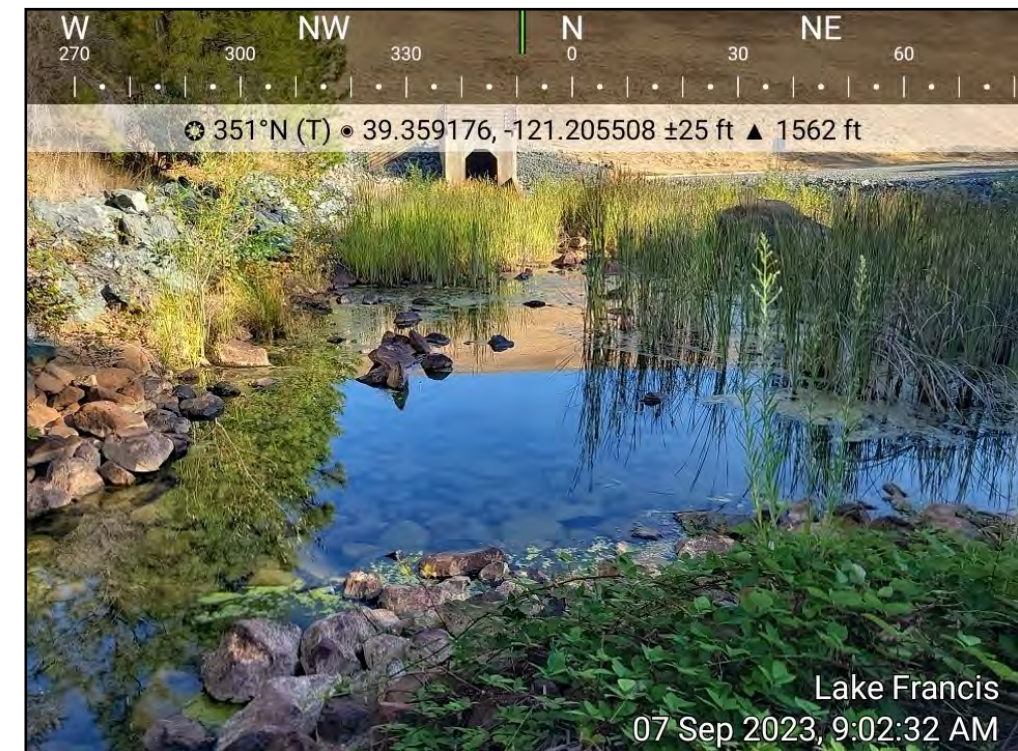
View of toe drain pool. Low level outlet structure can be seen in the background.
